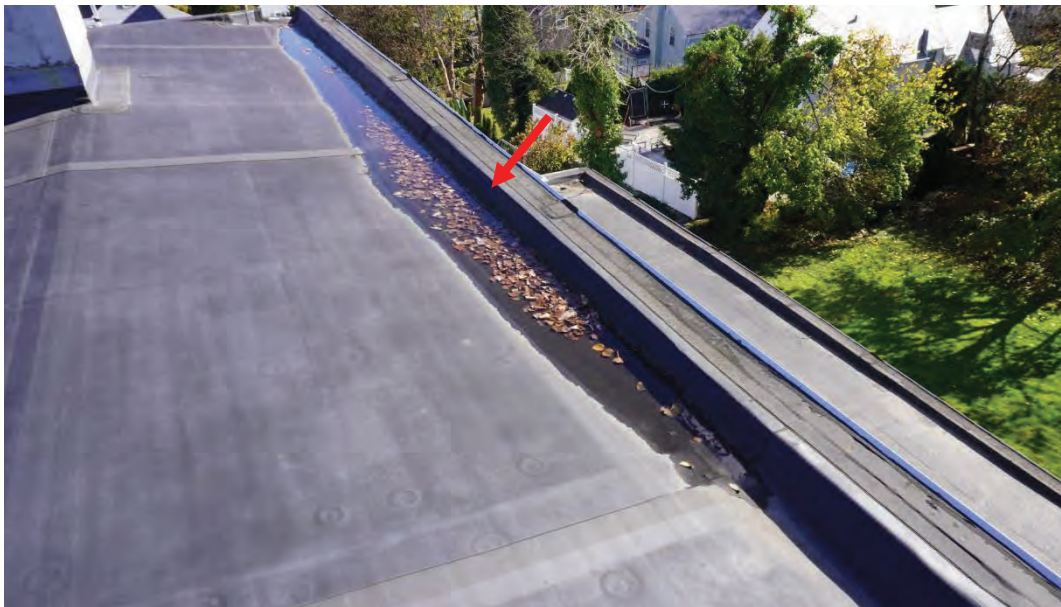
Roof structure has deflected causing water to pool. Roofing membrane observed to be fairly new.
